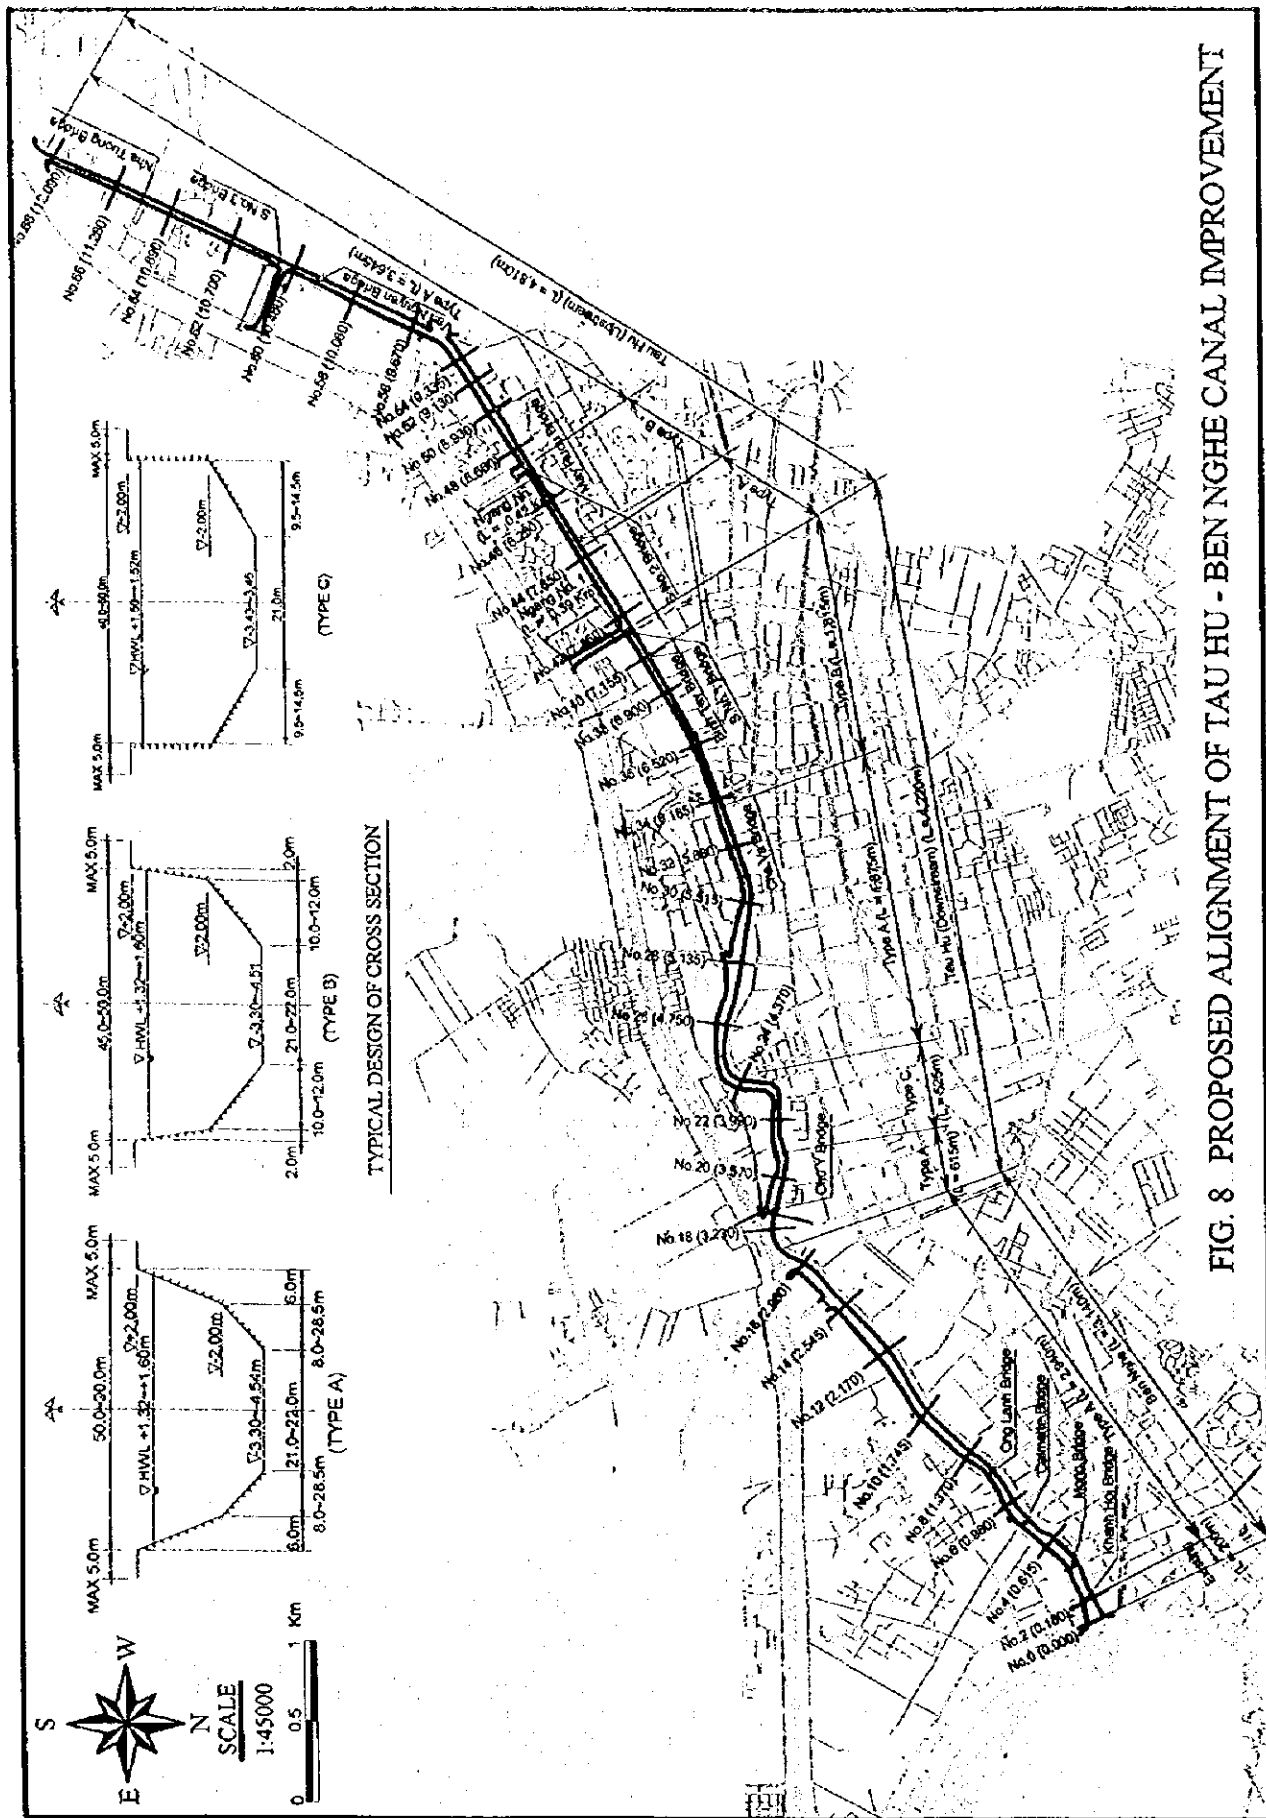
PROPOSED ALIGNMENT OF TAU HU - BEN NGHE CANAL IMPROVEMENT
